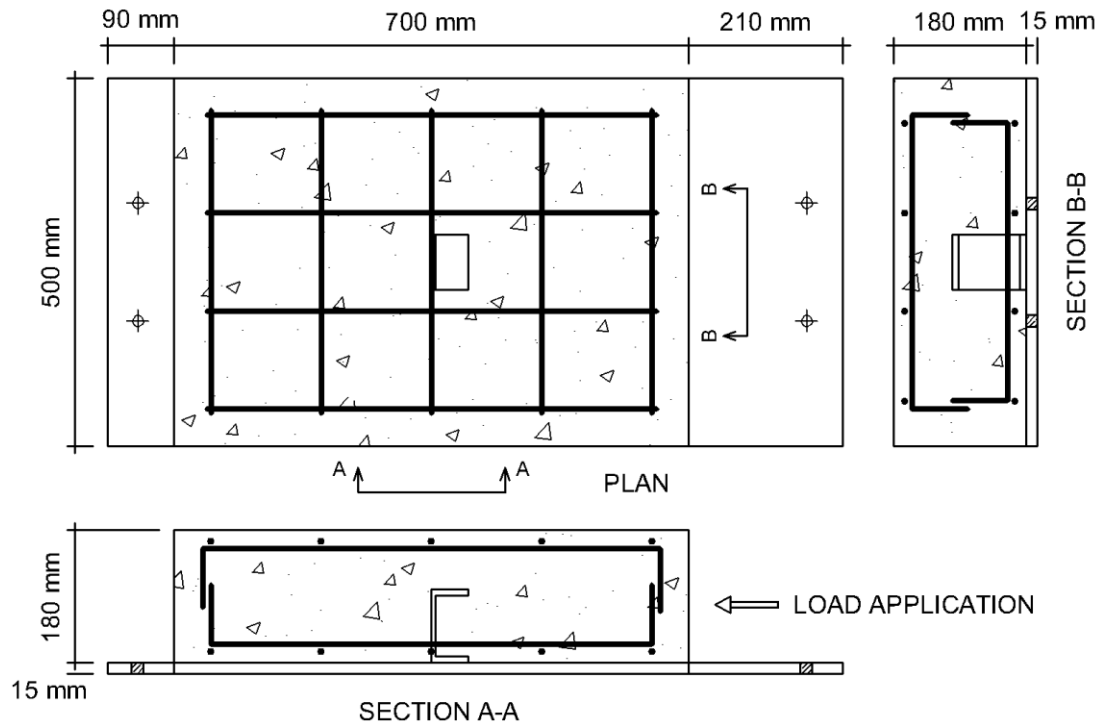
Push-Out Specimen Reinforcement Drawing
